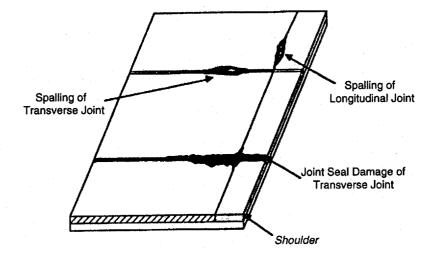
Surface defects of jointed concrete pavement.
